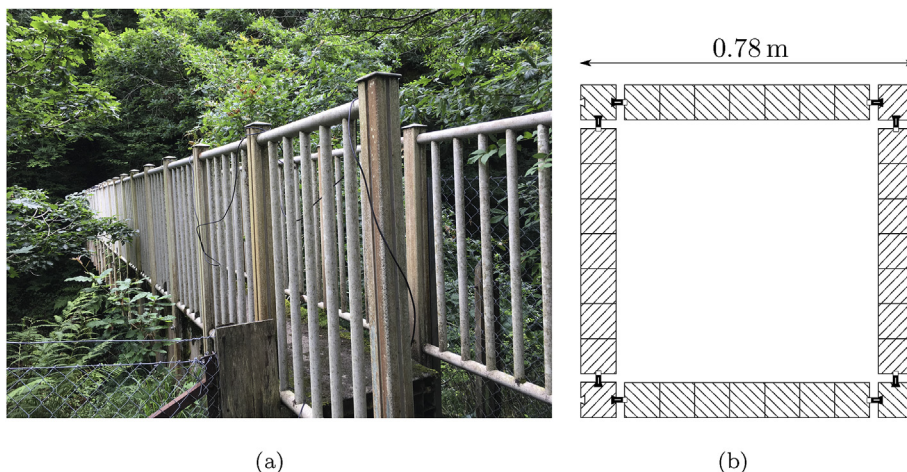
Lively footbridge (a) general view and (b) cross section of individual units that form the footbridge deck.
